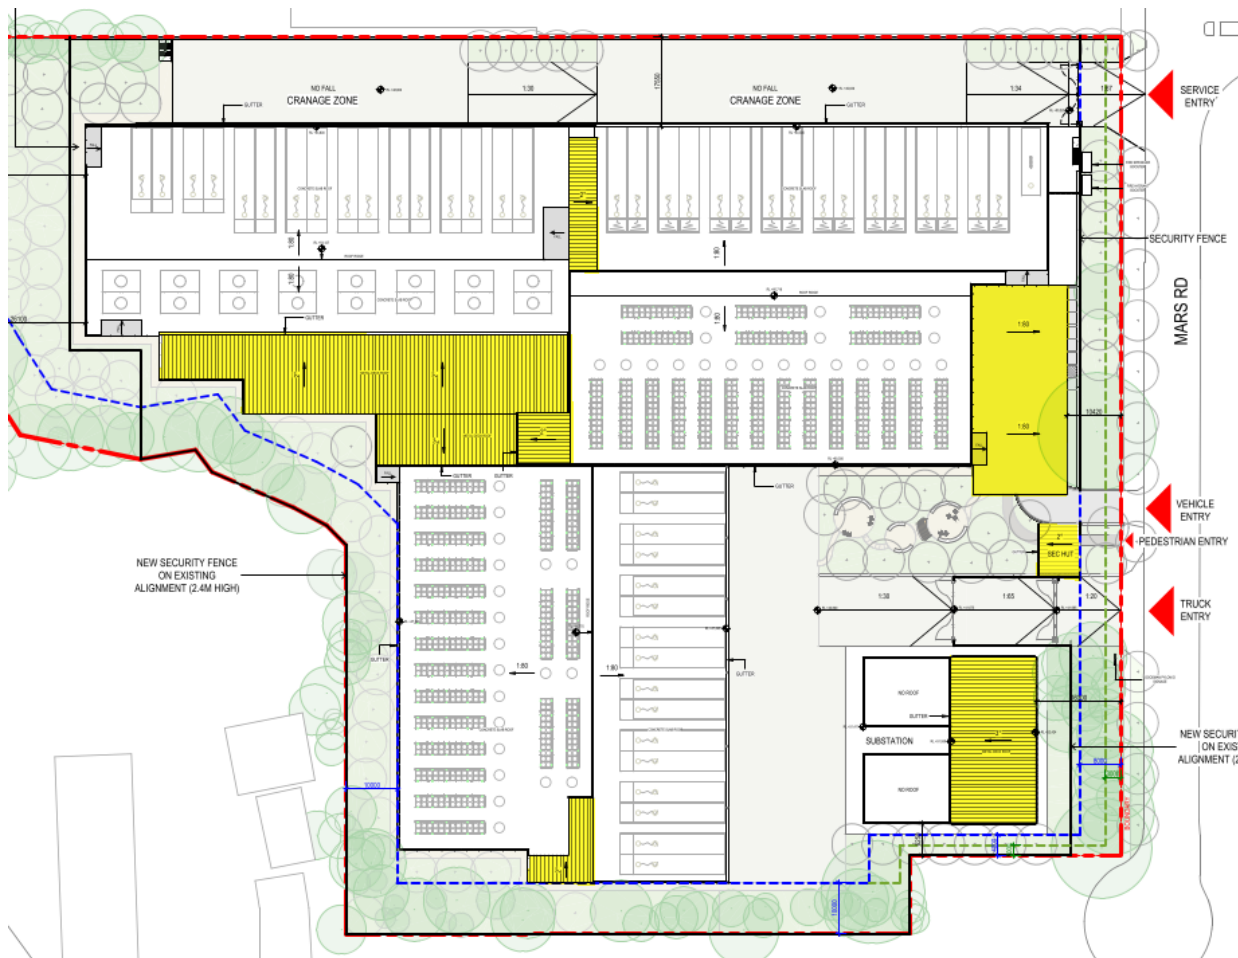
Vacant roof areas (3,023sqm) which should be occupied by solar panels (Source: Roof plan)
